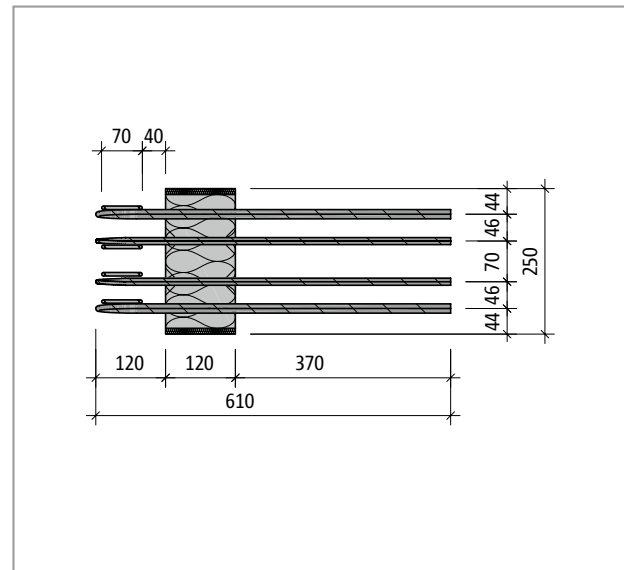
Schöck Isokorb® XT type F: Product plan view
